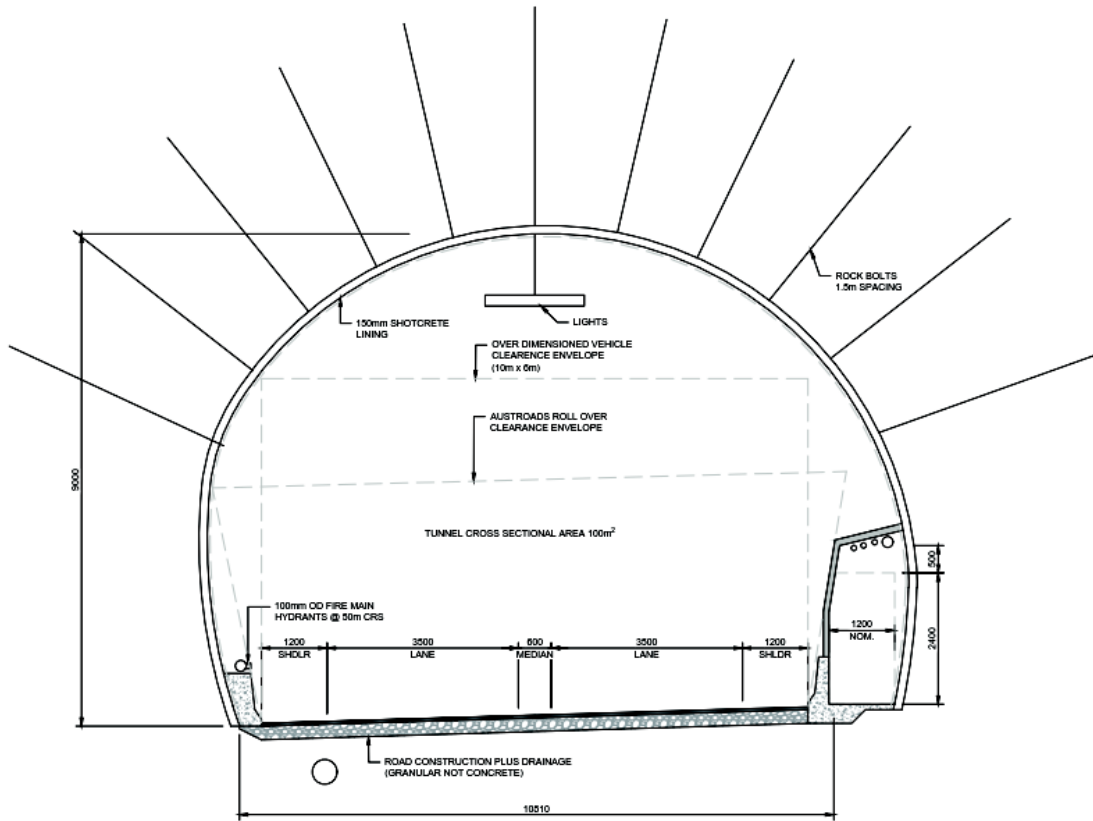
Typical Road Cross Section (see Drawing MMA-DES-GEM-E1-DRG-3001, Volume 2 of AEE)
